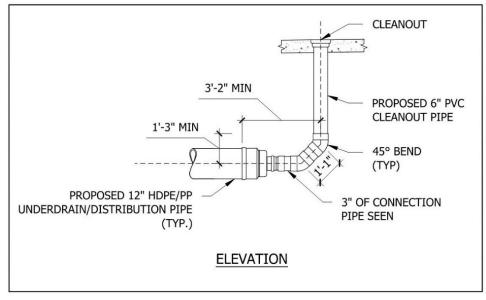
Typical end of pipe run cleanout for 12" HDPE/PP pipe
